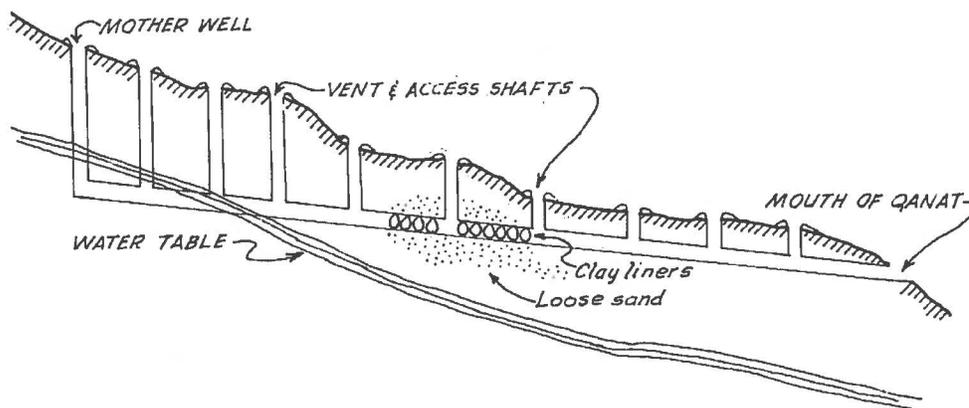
Schematic cross section of alluvial fan showing construction of a typical qanat.
